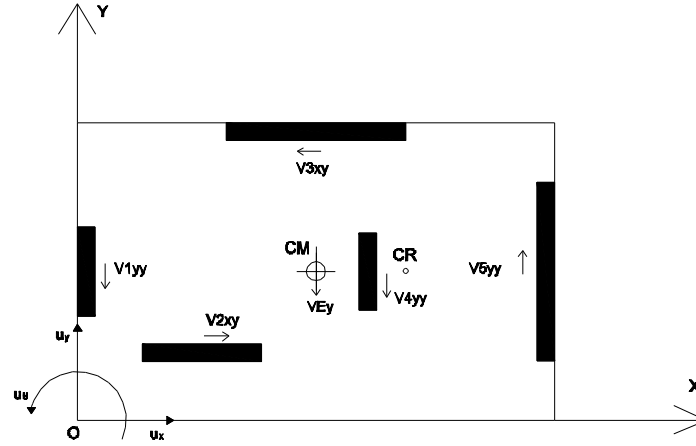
A typical plan view with shear walls denoting the degrees of freedom of the system
